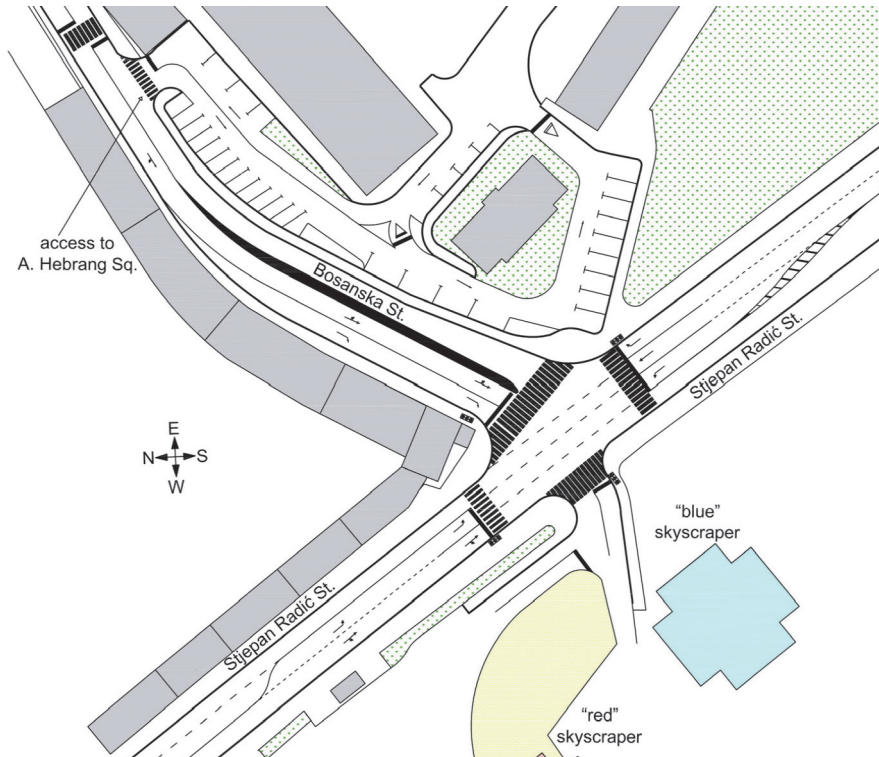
Stjepan Radić and Bosanska Street road intersection - current traffic situation
